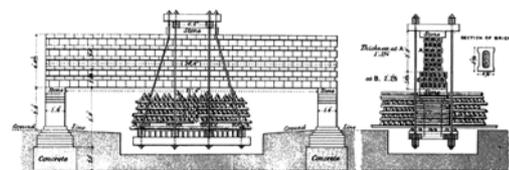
Wrought-reinforced hollow-brick beam, J.B. White and Sons, 1851. (Peters¹)
